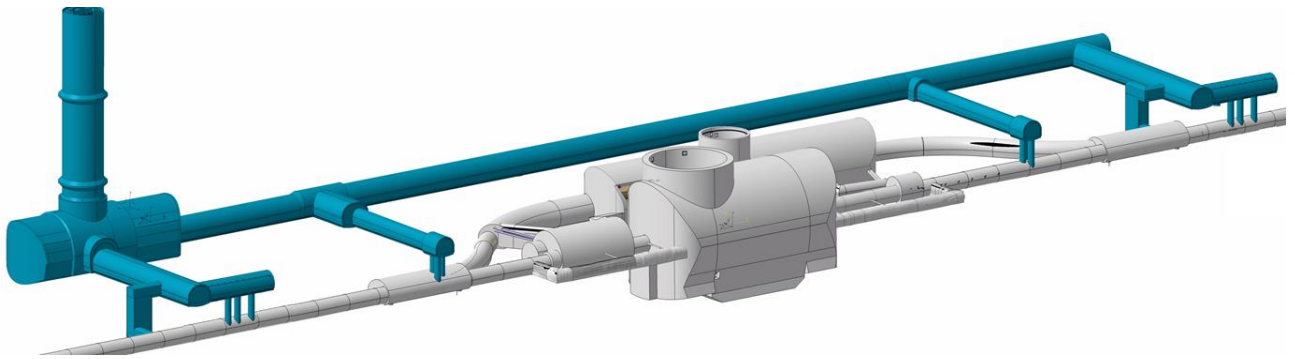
Axonometric view of the HL-LHC underground Civil Engineering infrastructures as it would appear in IP5.
